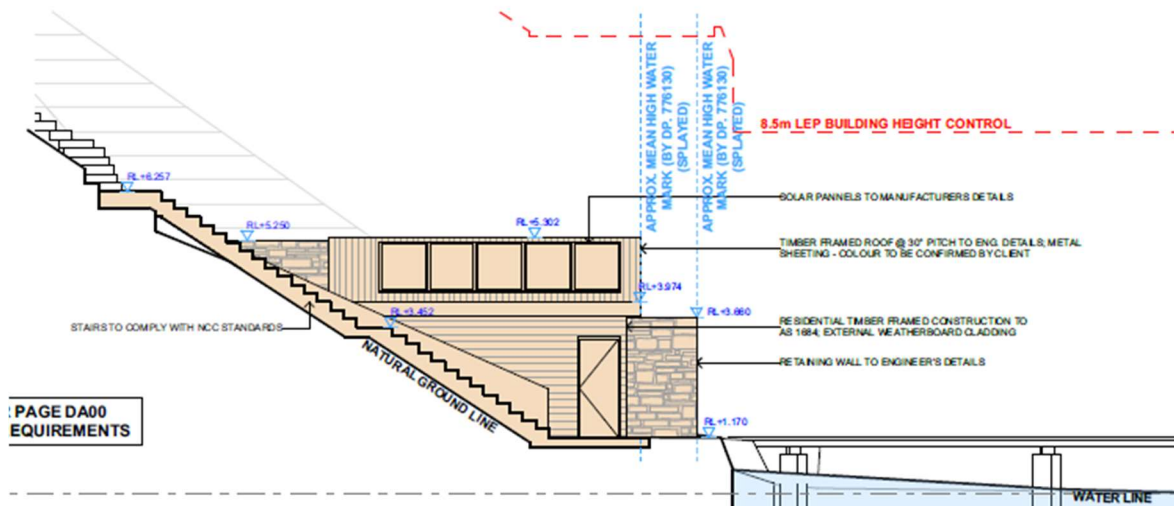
North Elevation of Proposed Boat Shed (extracted from drawings by
